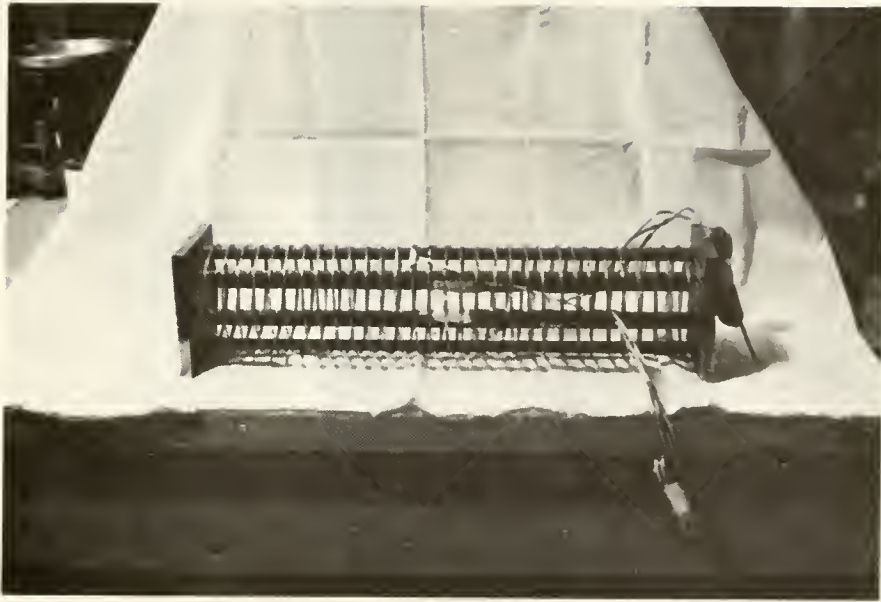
Reinforcing Cage for Spiral Specimen.
